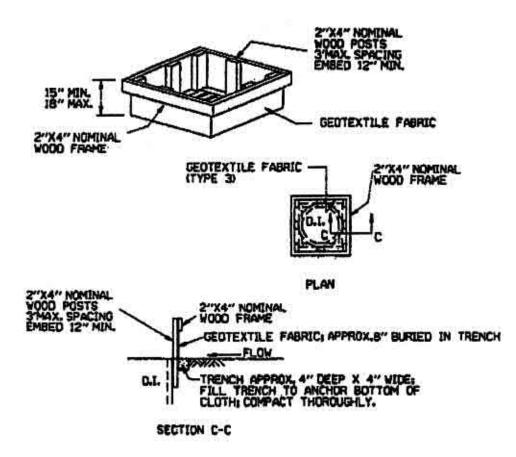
Silt fence inlet protection detail (Source: AHTD, 2001)
